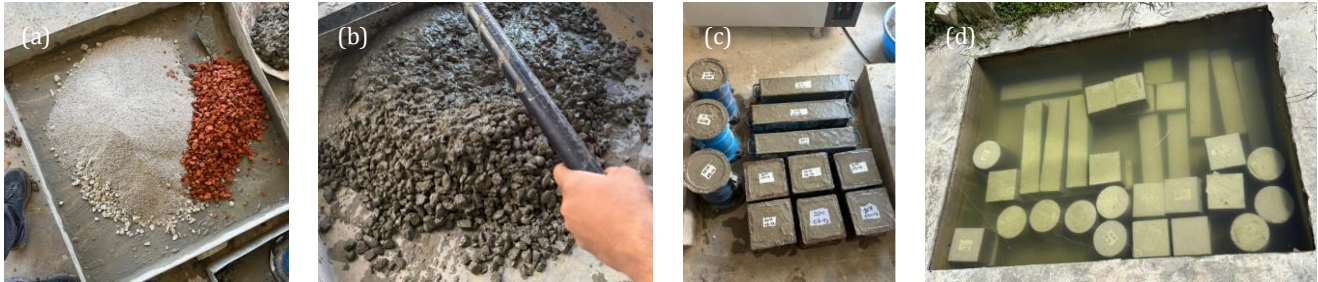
Preparation process of concrete: (a) Preparation of materials; (b) Mixing of concrete; (c) Casting of concrete specimens; (d) Curing of concrete specimens.
